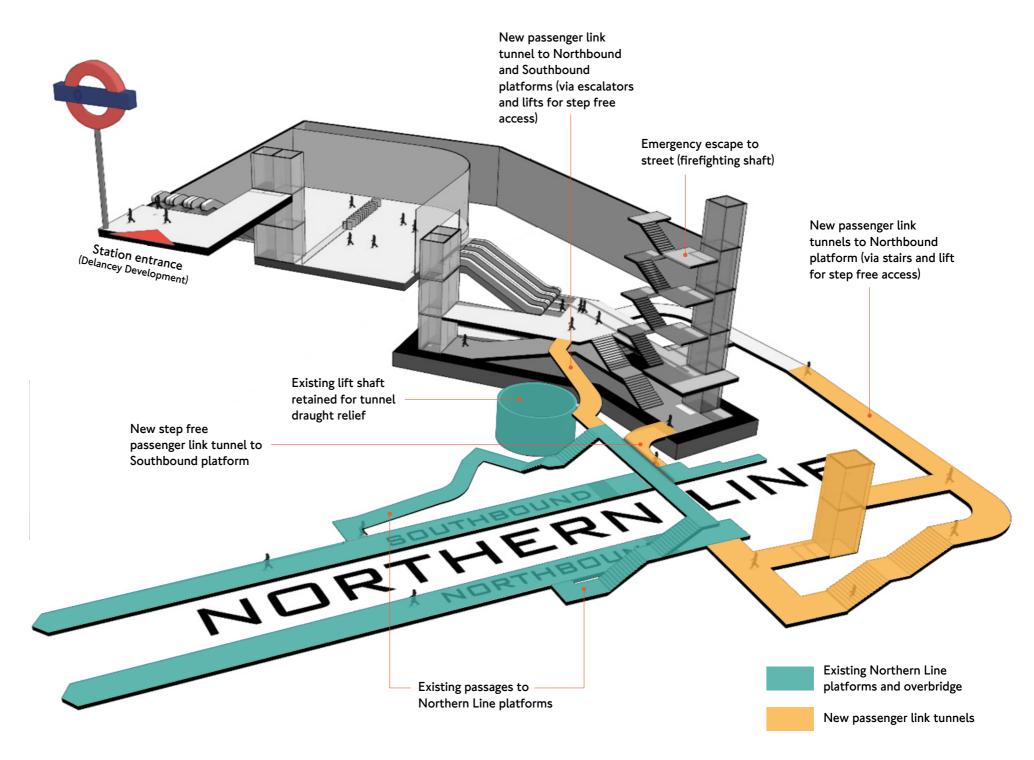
New Northern Line Ticket Hall and passenger underground connections
